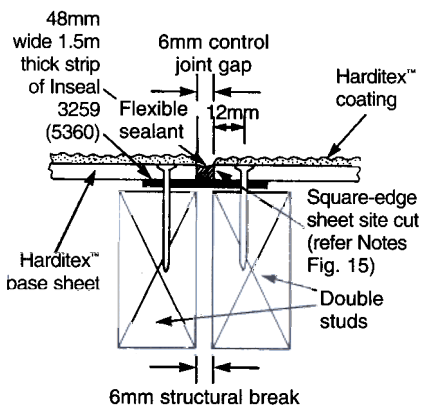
RECESSED-EDGE SHEET JOINT DETAIL
